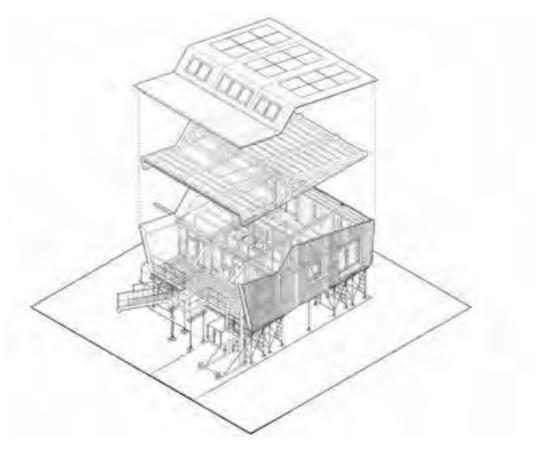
8. all materials and building elements are easily retrievable, the building acts as a material depot
